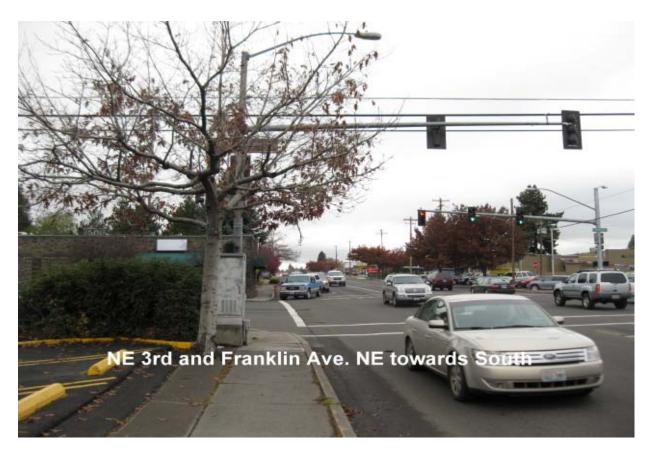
Site E-1. Luminaire ht ≈ 32 feet.
